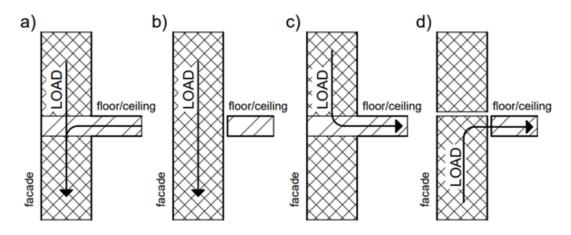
TYPES OF FACADES: a) LOAD-BEARING, b) SELF-BEARING CURTAIN WALL, c) FILLING CURTAIN WALL, d) HANGED CURTAIN WALL
